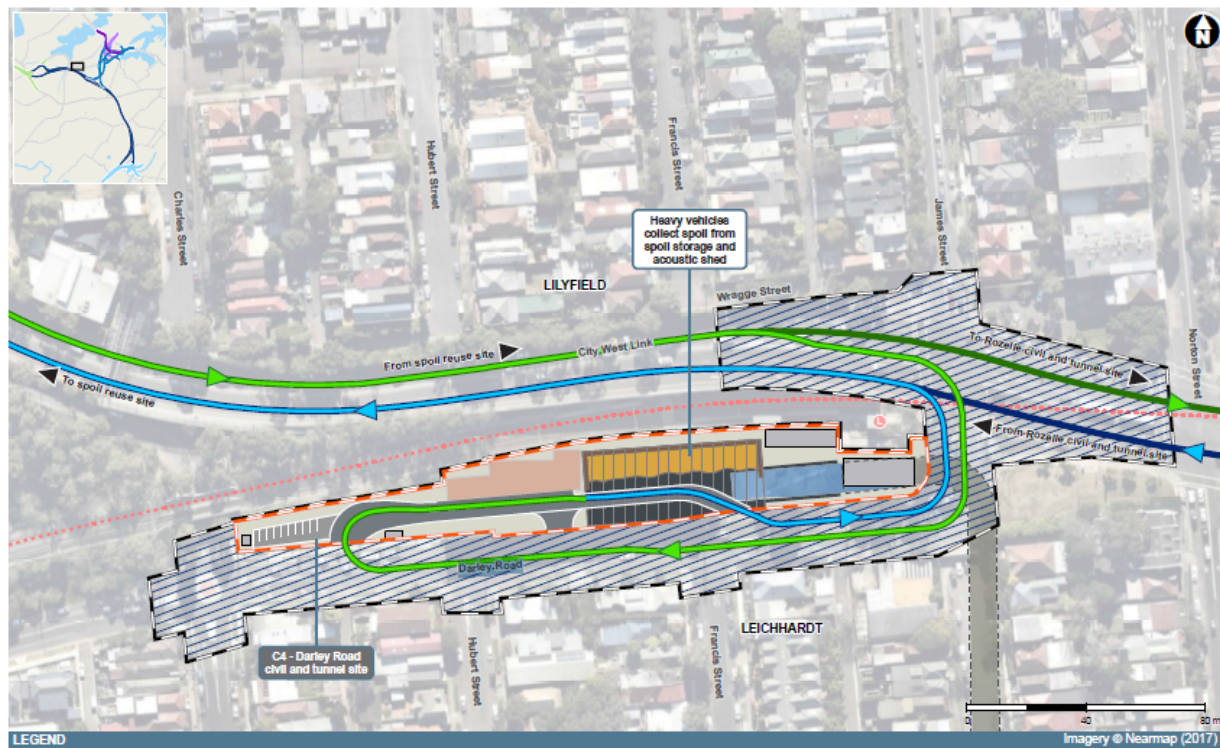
Indicative spoil haulage route – Darley Road civil and tunnel site (C4)
